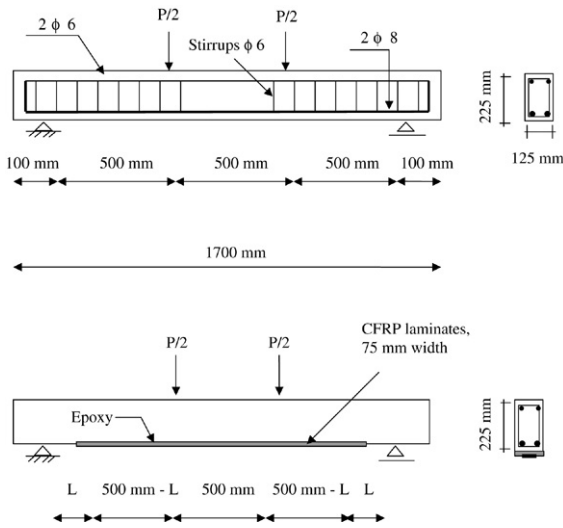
Details of RC beams and arrangement of CFRP reinforcement [5].
